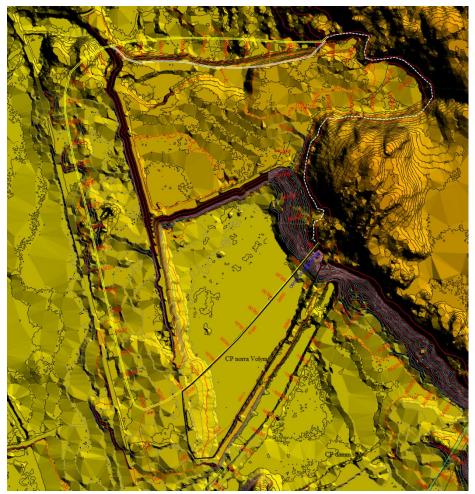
Plan view of northern TMF embankment (yellow) with clarification pond embankment in black. Potential change of dam location in north indicated with with line. White dotted line illustrates the confinement of the tailings by the natural elevation.
